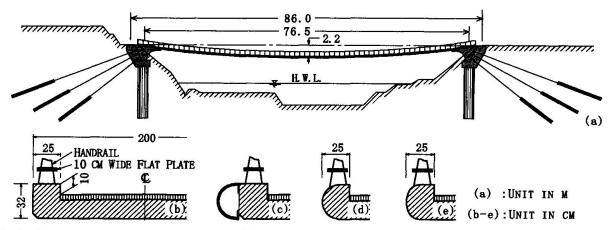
The Jomon Bridge. The elevation (a); the original cross-section with and without the half-circular fairings (b, c); the modified ones with the half-circular and the half-elliptic edges (d, e).
